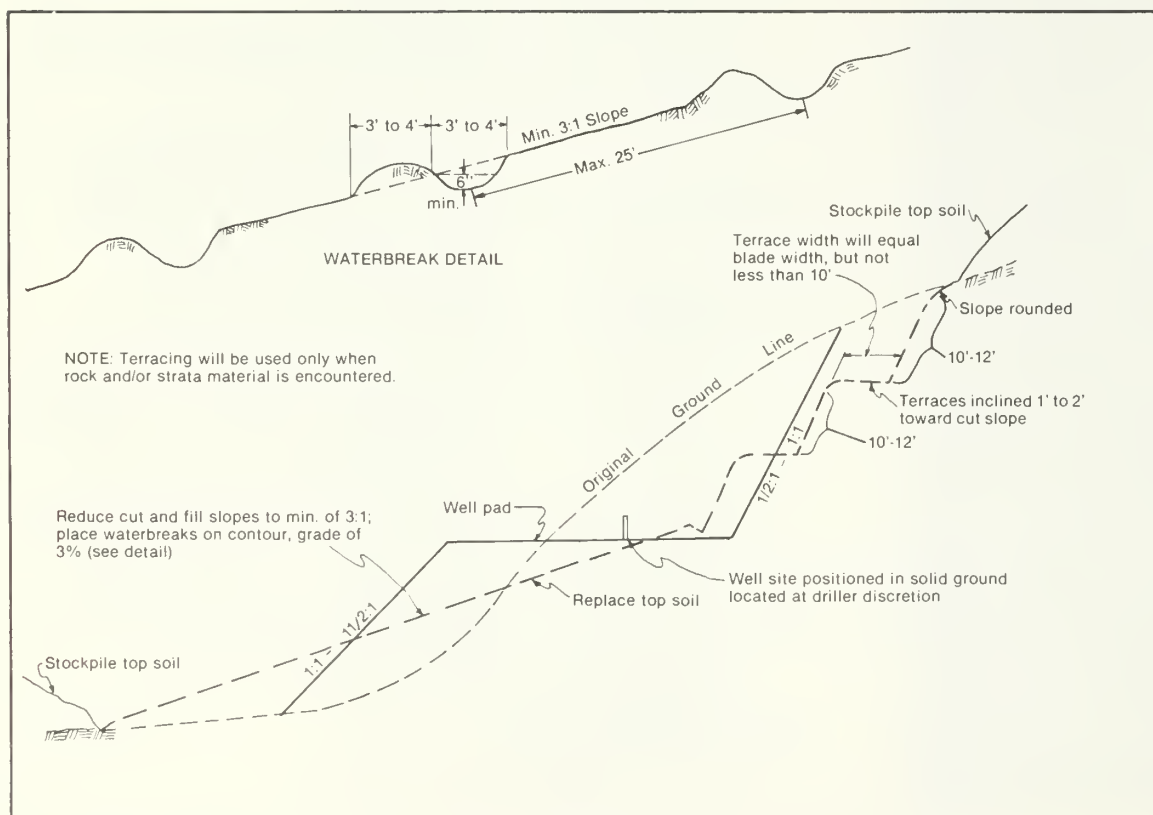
Well Site Restoration and Stabilization by Terracing Cut Slopes
